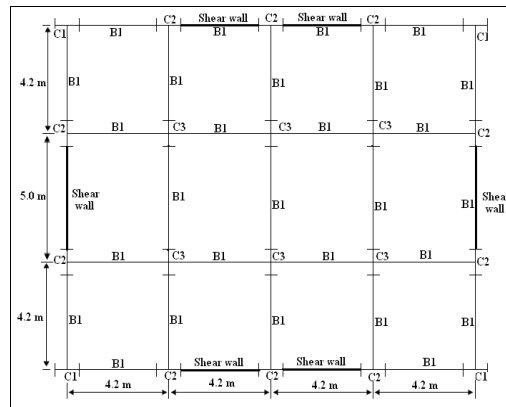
Plan of a G+6 storey building with steel plate shear walls
